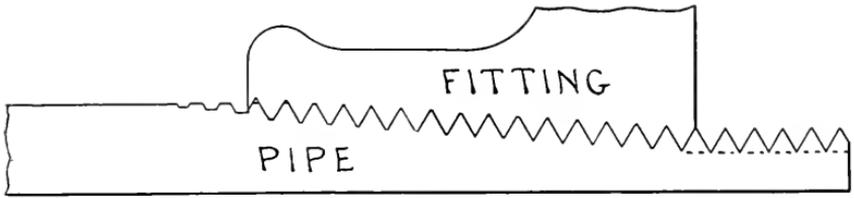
ILLUSTRATING THE PIPE PROJECTING THROUGH THE FITTING.
